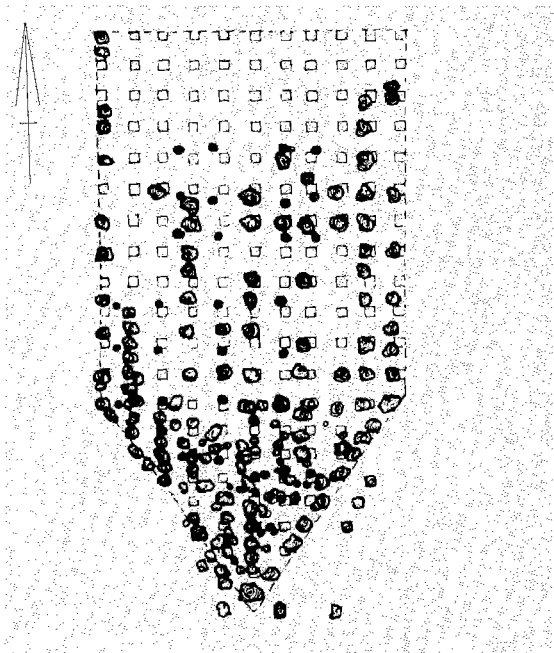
Bridge at Trier: plan of pier 7 of the first-century bridge. (after Hollstein 1980)
